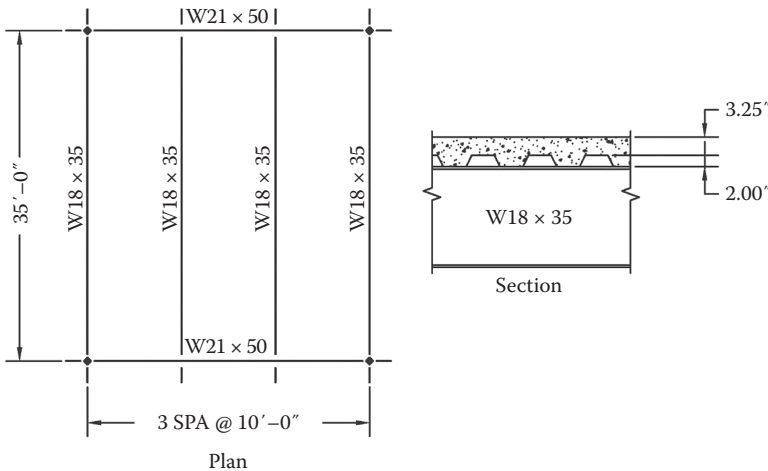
Interior bay floor framing plan (1 in. = 25.4 mm and 1ft = 0.305 m).
